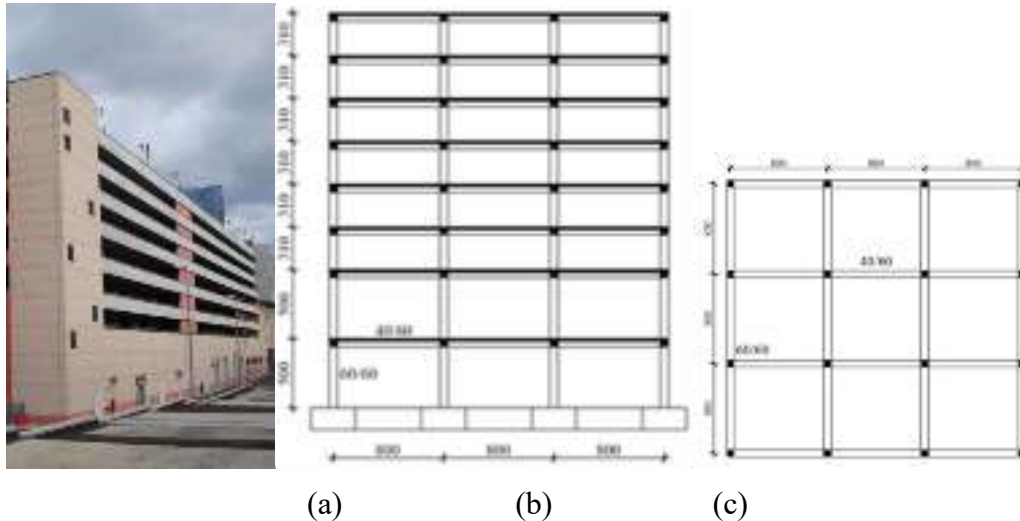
(a) Building of garage of the Tower Centre, Rijeka, Croatia; (b) Cross-section; (c) Plan of one segment of the garage structure
